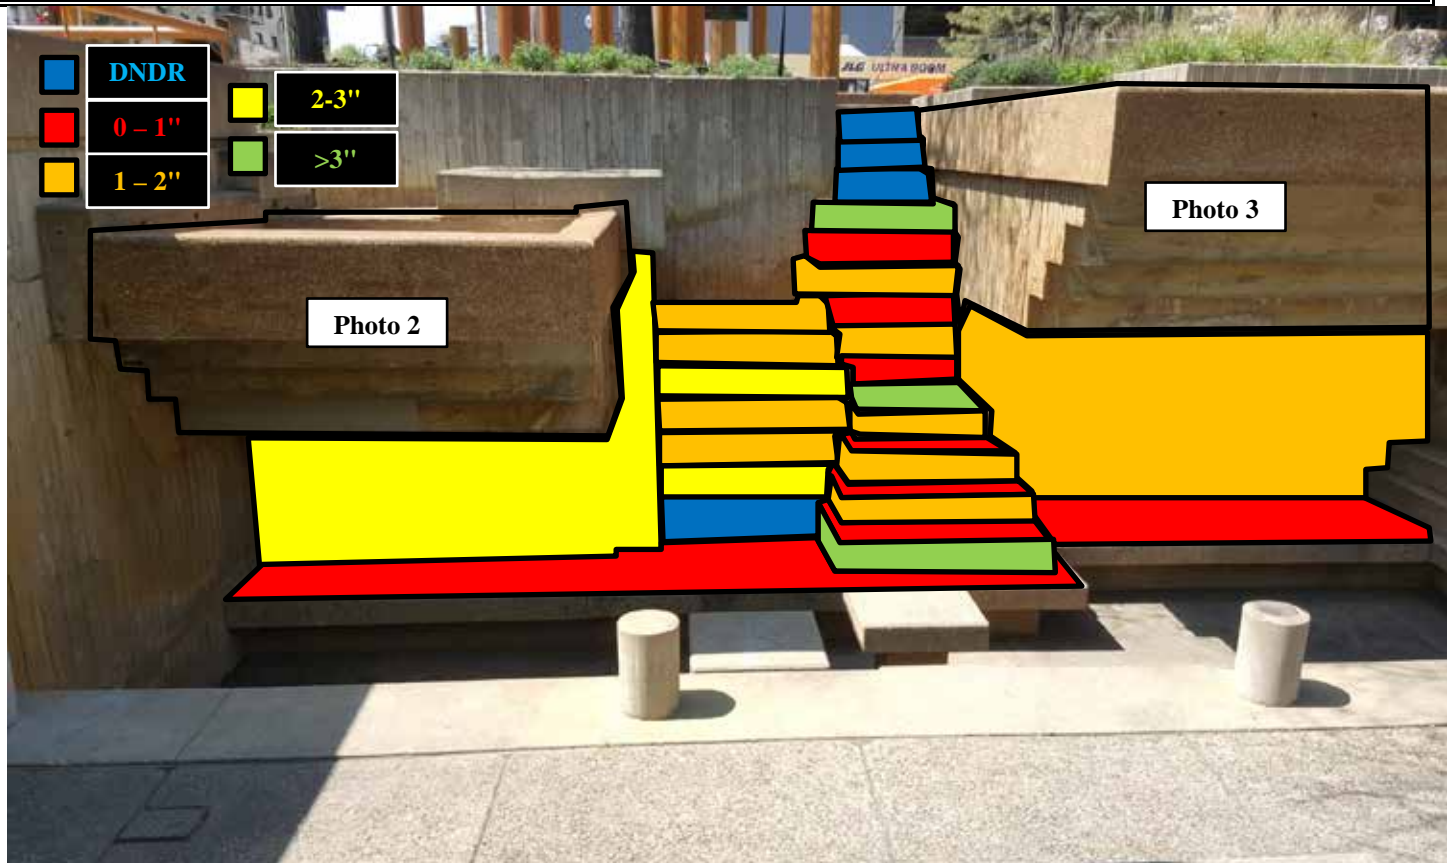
Overhang 4 – Facing Marquette Avenue. DNDR – Did Not Detect Reinforcement
